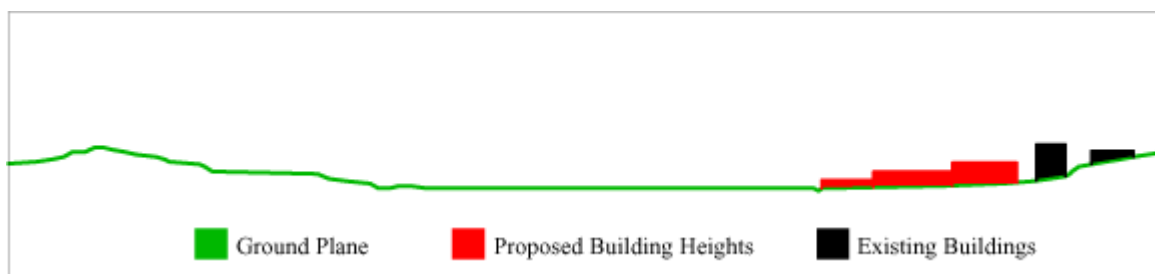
East-West Site Section from Peachtree Rd. to Northside Dr.
